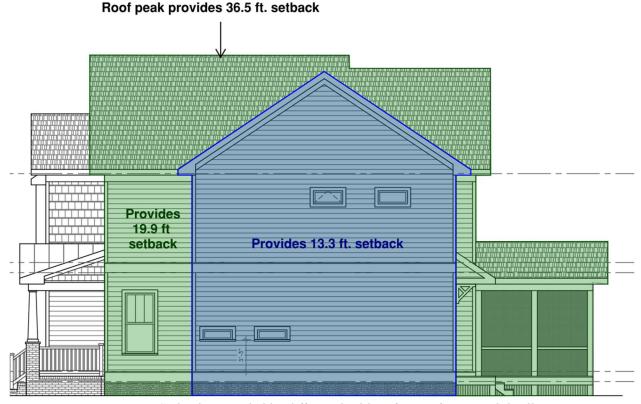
Setbacks provided by different building forms of proposed dwelling
